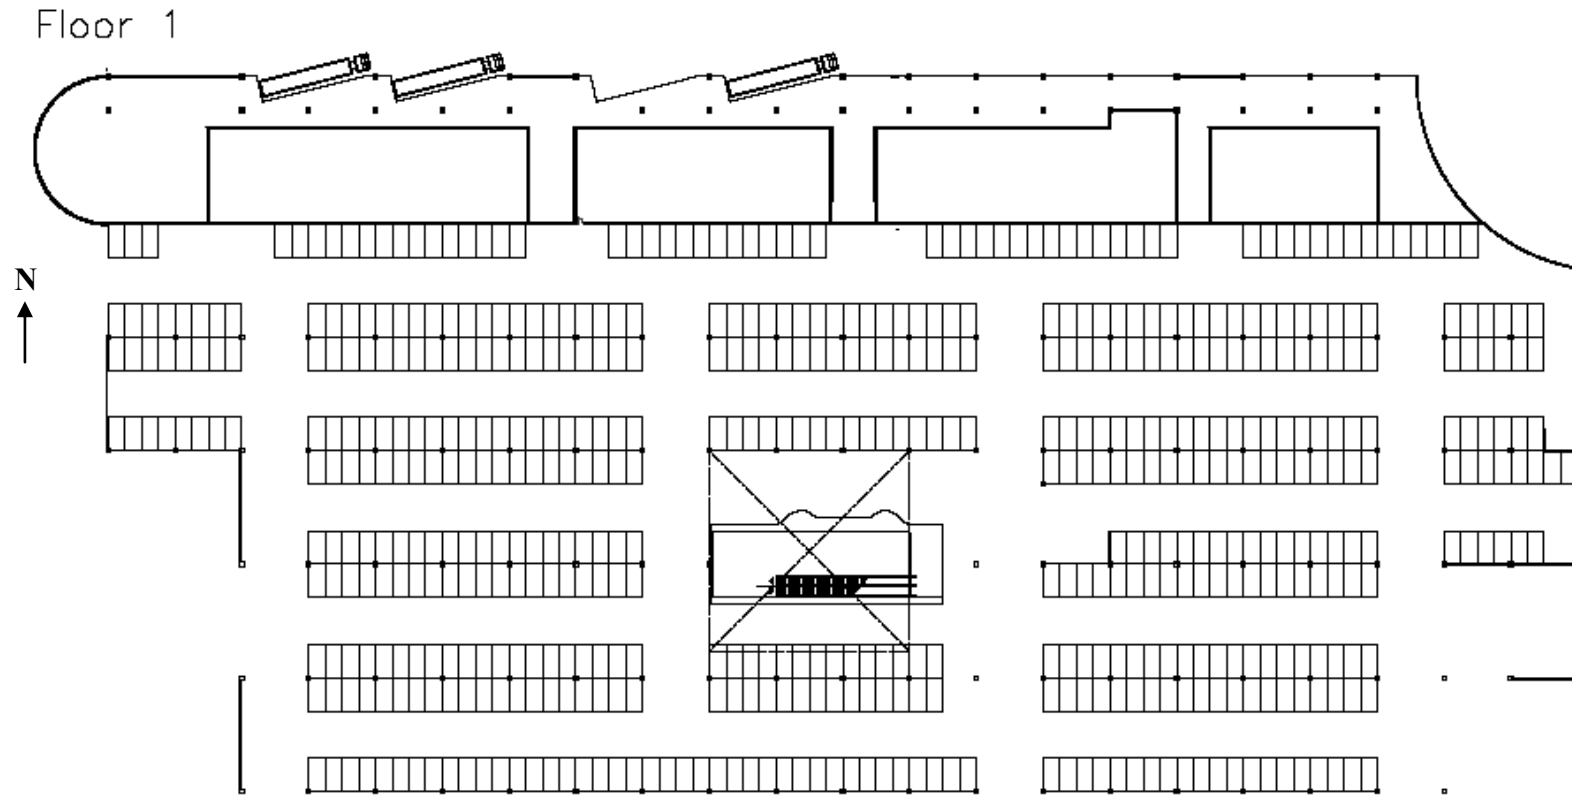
Original Shopping Mall Building Plan – Floor 1 (Ground Floor)
